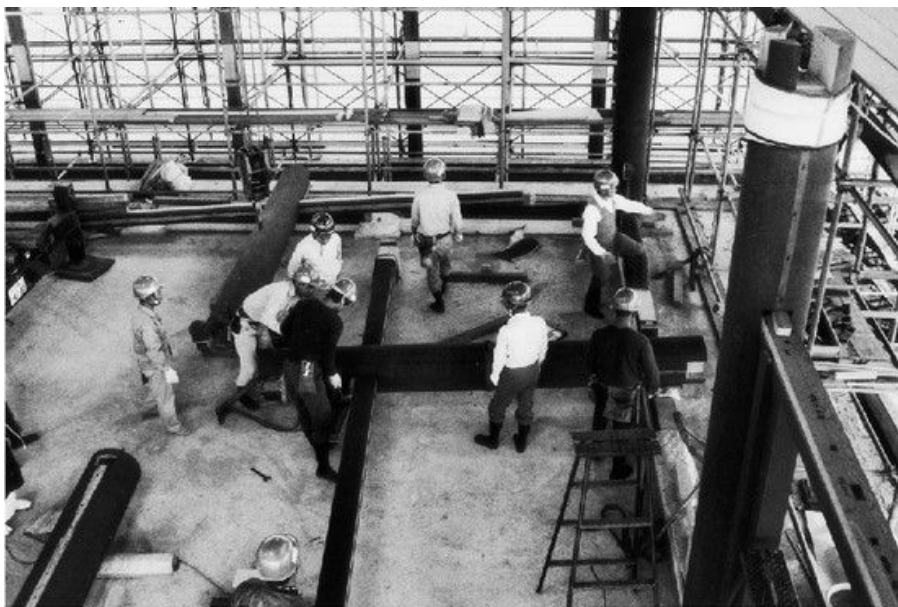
Mid-wall penetrating tie beams were inserted into the columns on the ground, and then raised as a section.
